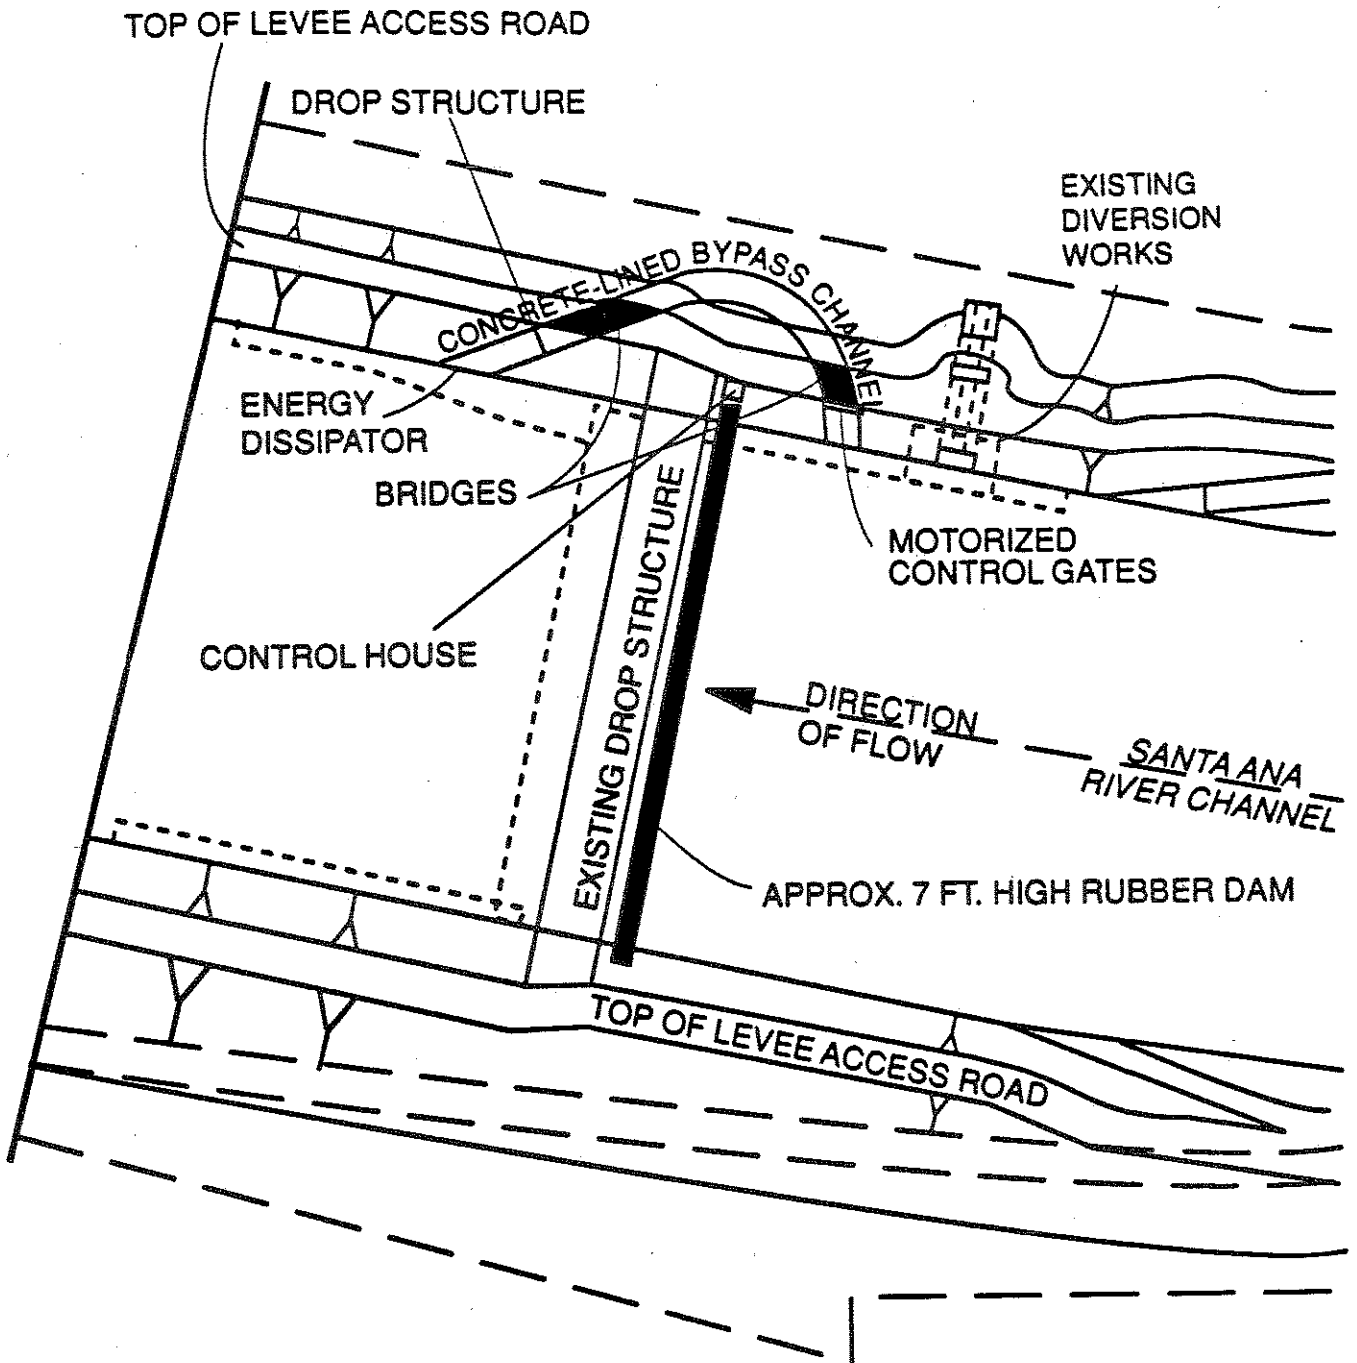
PROPOSED RUBBER DAM BYPASS CONFIGURATION
